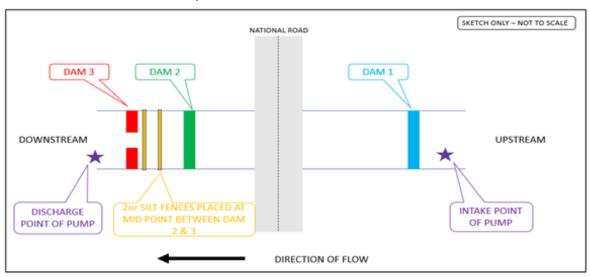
Schematic of the 3-no. dam dewatering system proposed at Strade River Bridge.
